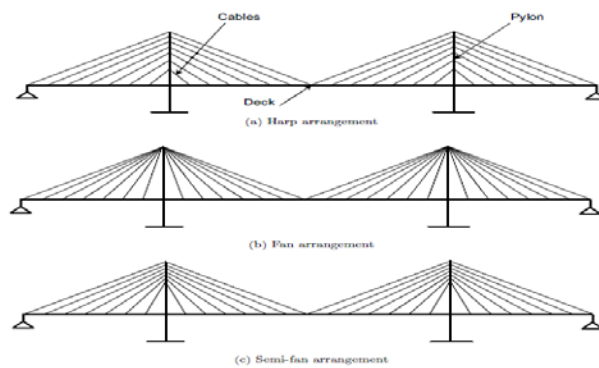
Types of Cable-Stayed Bridge (O.Zadeh, 2012).
